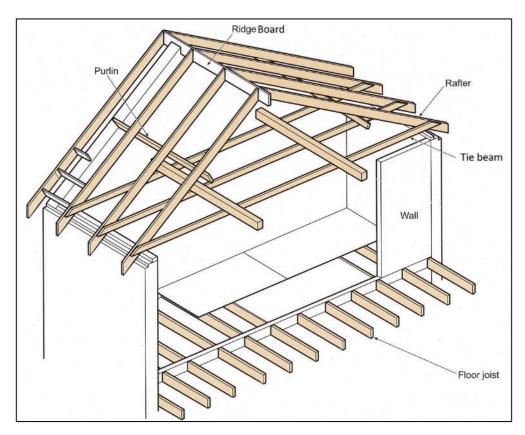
House elements (http://kingmoorconsulting.co.uk).
